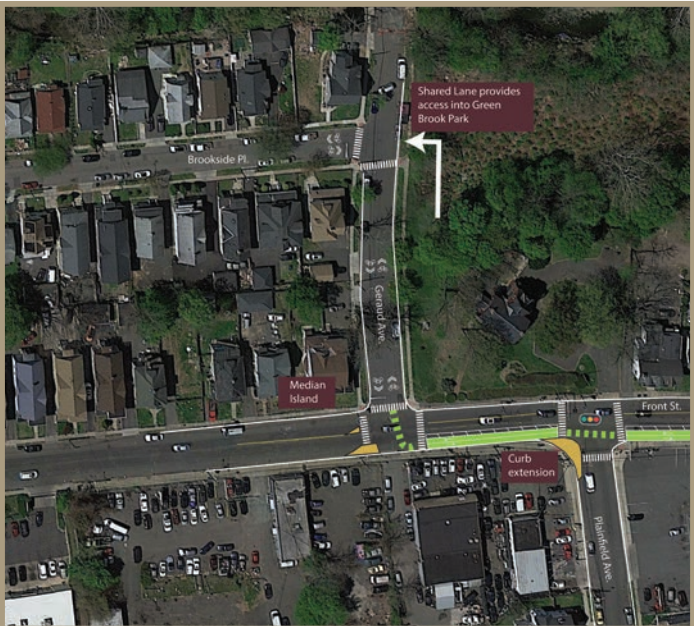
Map showing proposed West Front Street bicycle path connecting to Geraud Avenue and Brookside Place.
